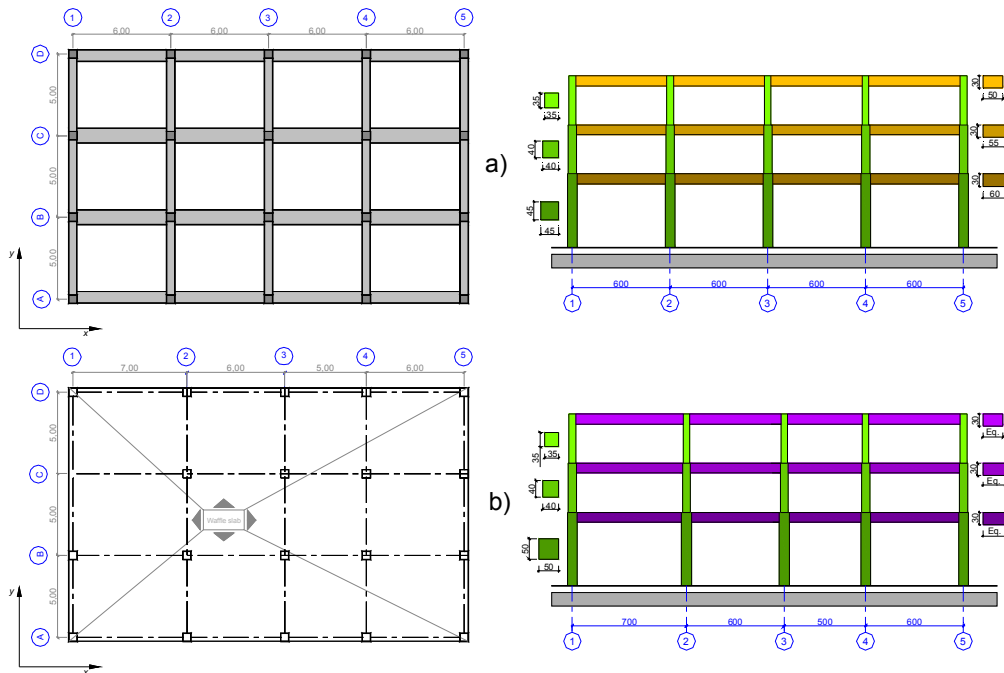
a) Typical plan and elevation view of the building with waffled slabs and b) the framed building with flat beams
